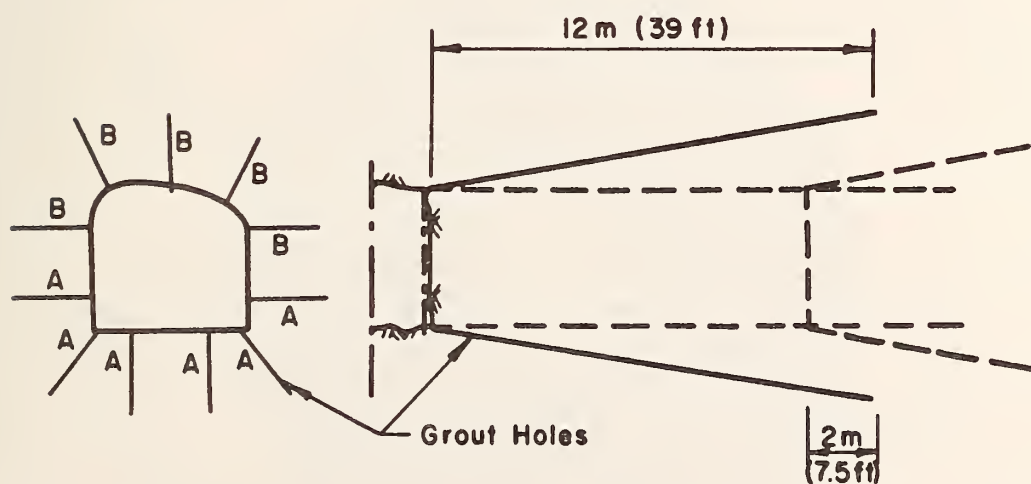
Drainage and Rock Grouting Pattern for Rail Tunnel in Oslo (Ref. 201)
